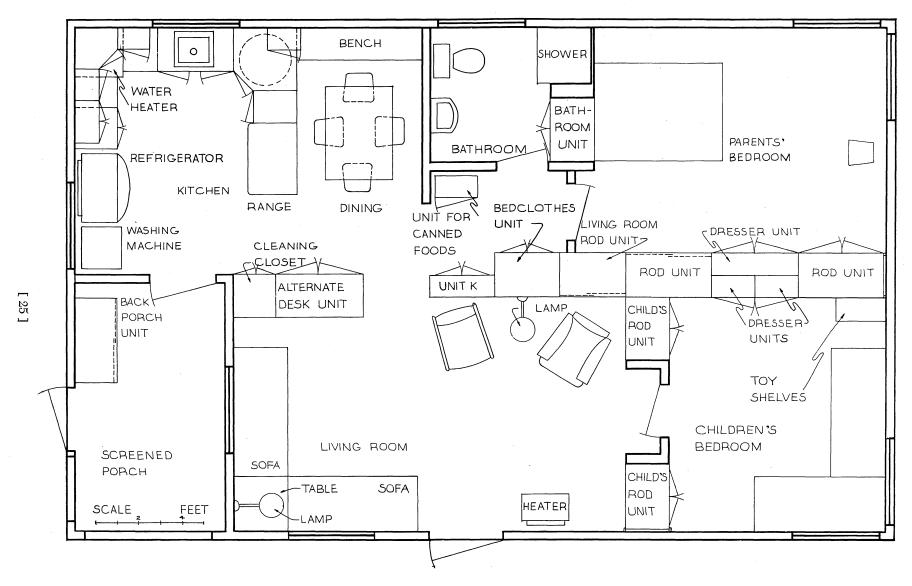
Plan of storage-wall laboratory, alternate arrangement.
